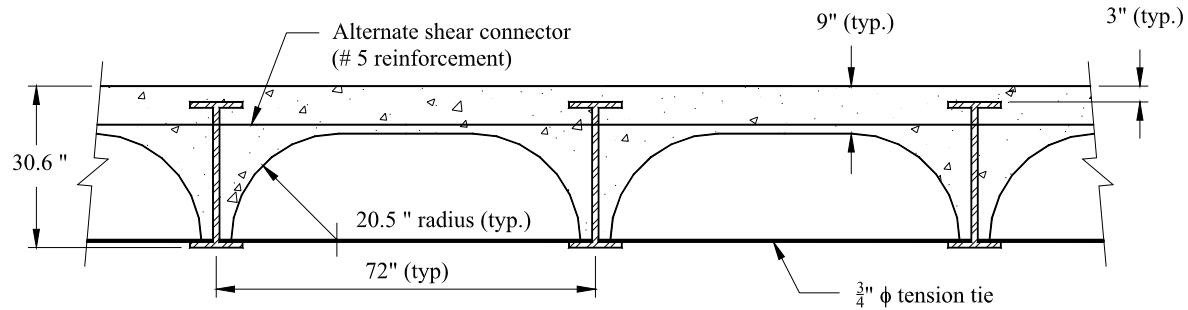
Cross section of a modified beam-in-slab system [adapted from Klaiber et al., 2004].
